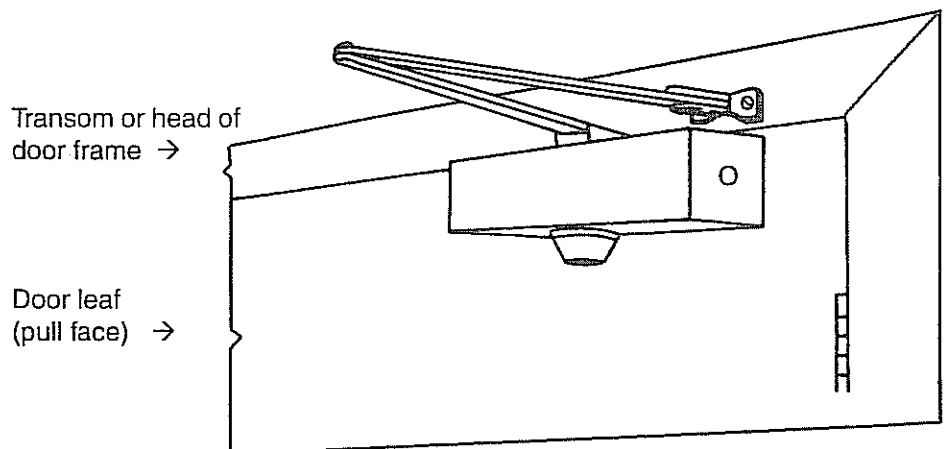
Face Fixed Overhead Closer mounted on pull face of door
